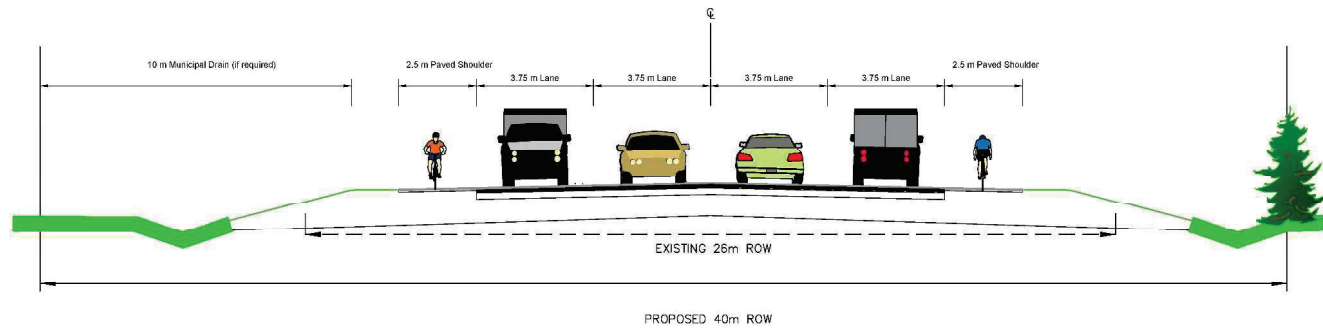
Section 2 Alternative 5 - 4-Lane Rural Cross Section
